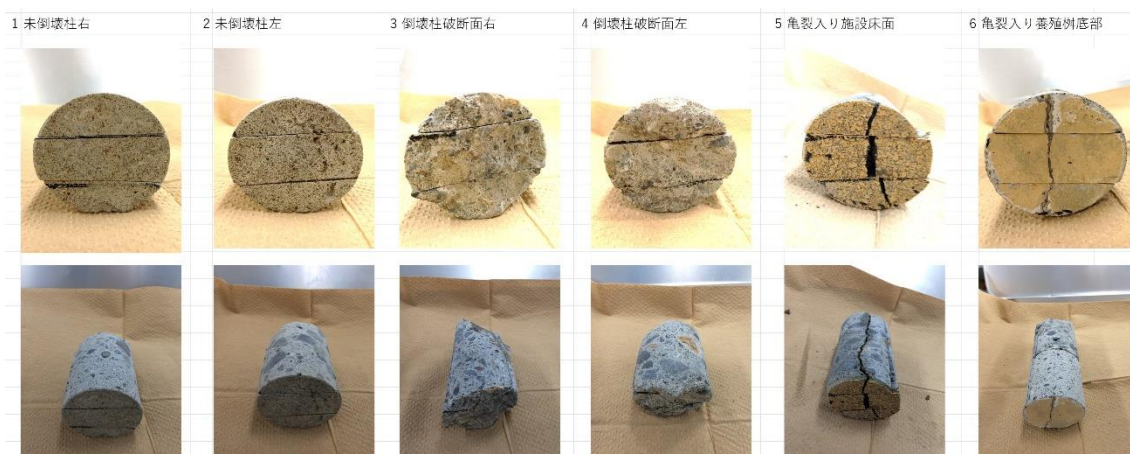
Appearances of the sampled cores. 1. Upright column right, 2. Upright column left, 3. Collapsed column without cover concrete right, 4. Ibid. left, 5. Cracked floor of the facility, 6. Cracked basement of aqua-farming pond.
